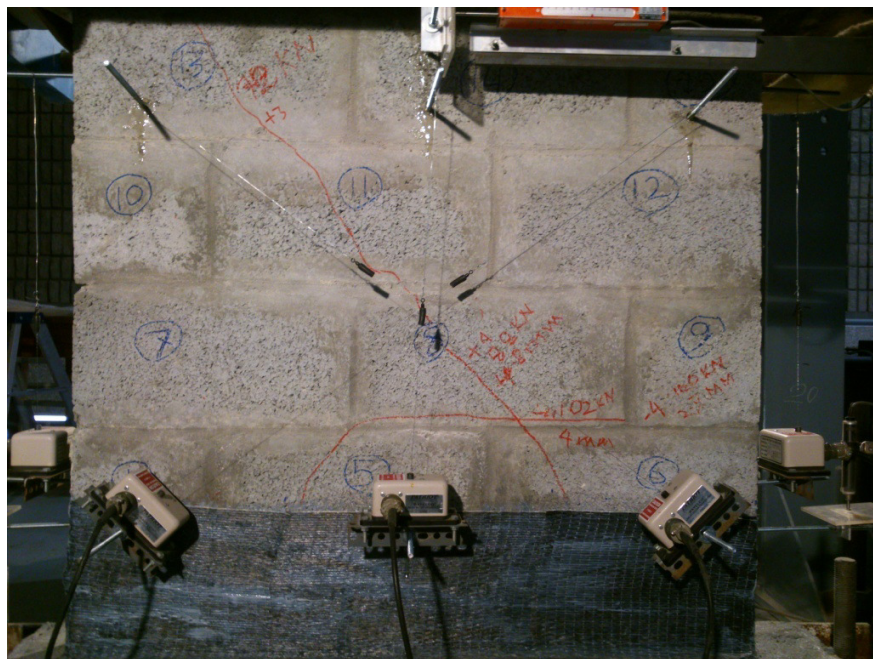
Damage Associated with 4.9 mm Push/Pull Loading, NCMW Wall
